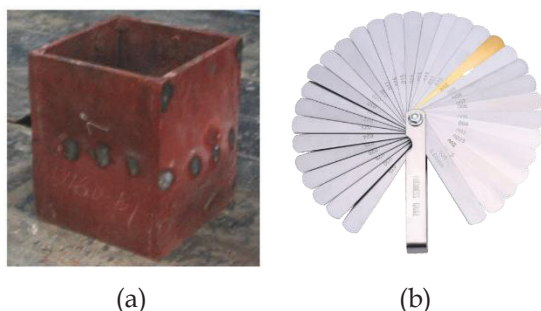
Measuring imperfections: (a) Box specimen and (b) feeler gauge [13]
